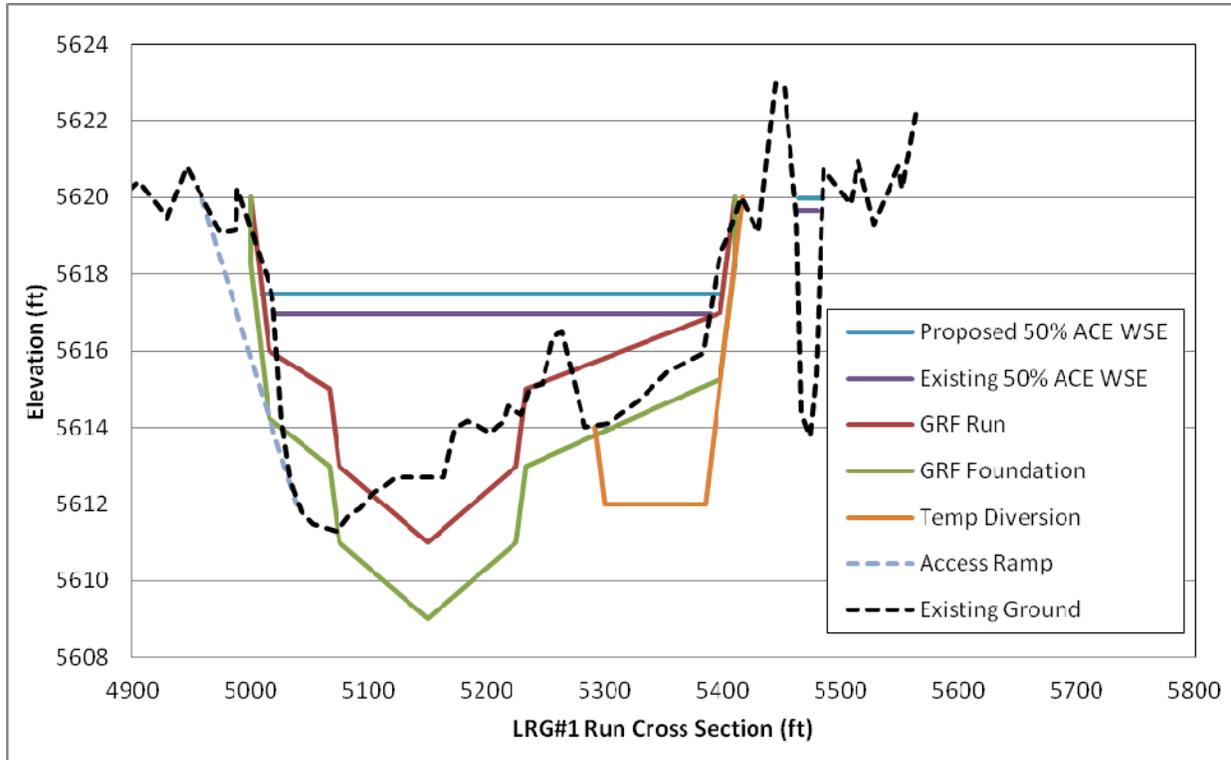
Cross section (downstream view) of the runout of the Lower Rio Grande GRF #1.
